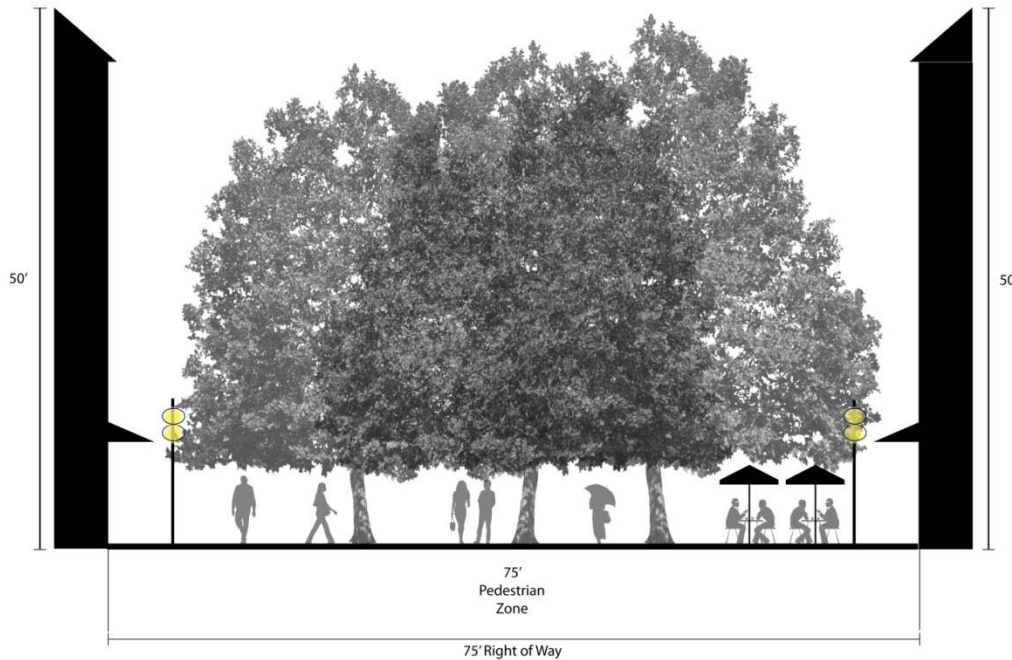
Neuhauser Straße-Kaufingerstraße street section
